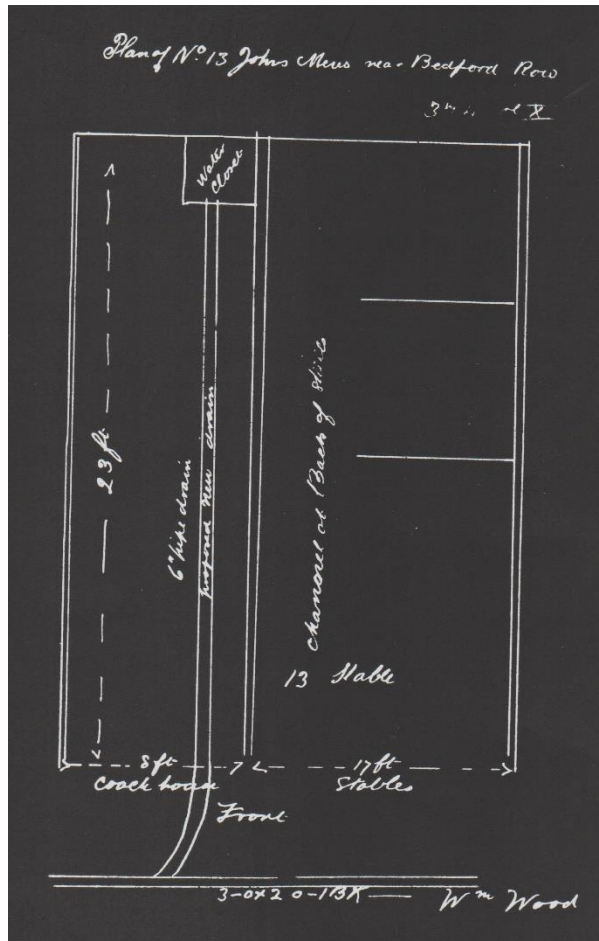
the ground plan of 13 Johns Mews in 1854 (Camden drainage plans)
